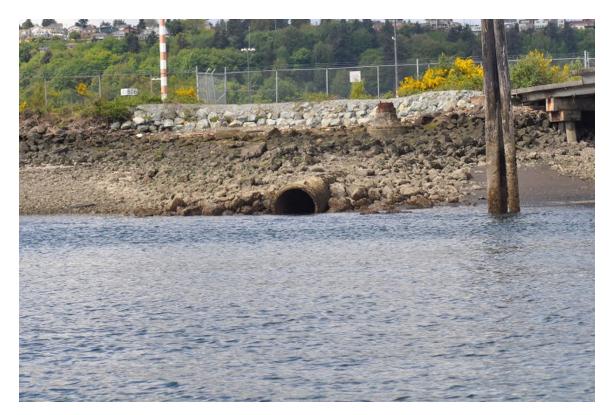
SW Florida Street Outfall discharge pipe looking from the West Waterway
